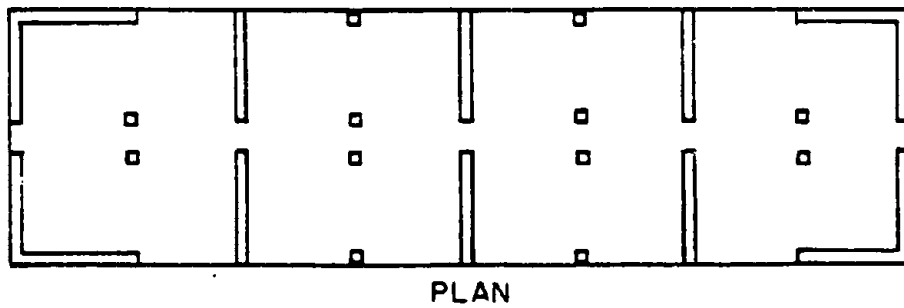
Common Use of Coupled Walls in Residential Buildings
